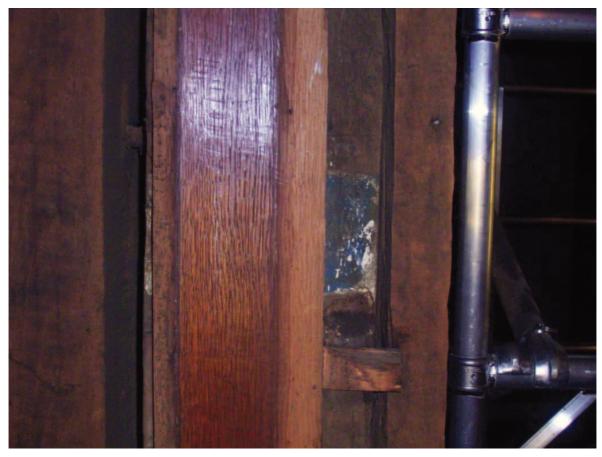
Royal Pew, Chapel Royal, Hampton Court Palace:Royal Pew, ground floor, west elevation of ante chapel wall. Detail of graffiti. See Appendix I - VI for detailed tracings.
